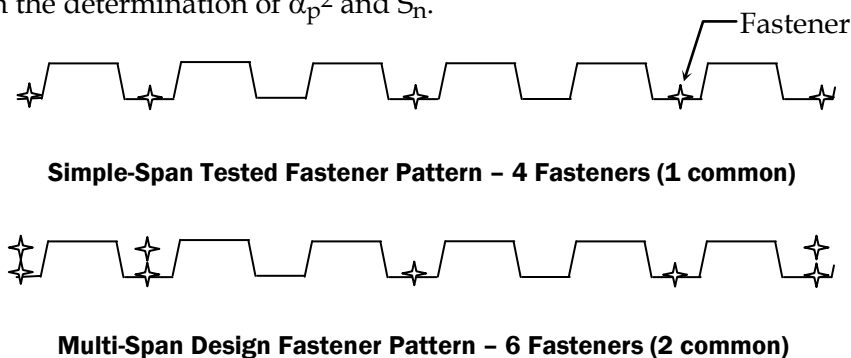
Fasteners Required in Multiple-Span Application Based on Single-Span Test of a Single Diaphragm System
